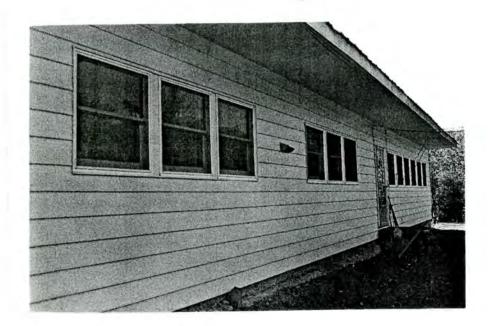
Stoney Fork School, Modernized North Elevation, Looking West.
